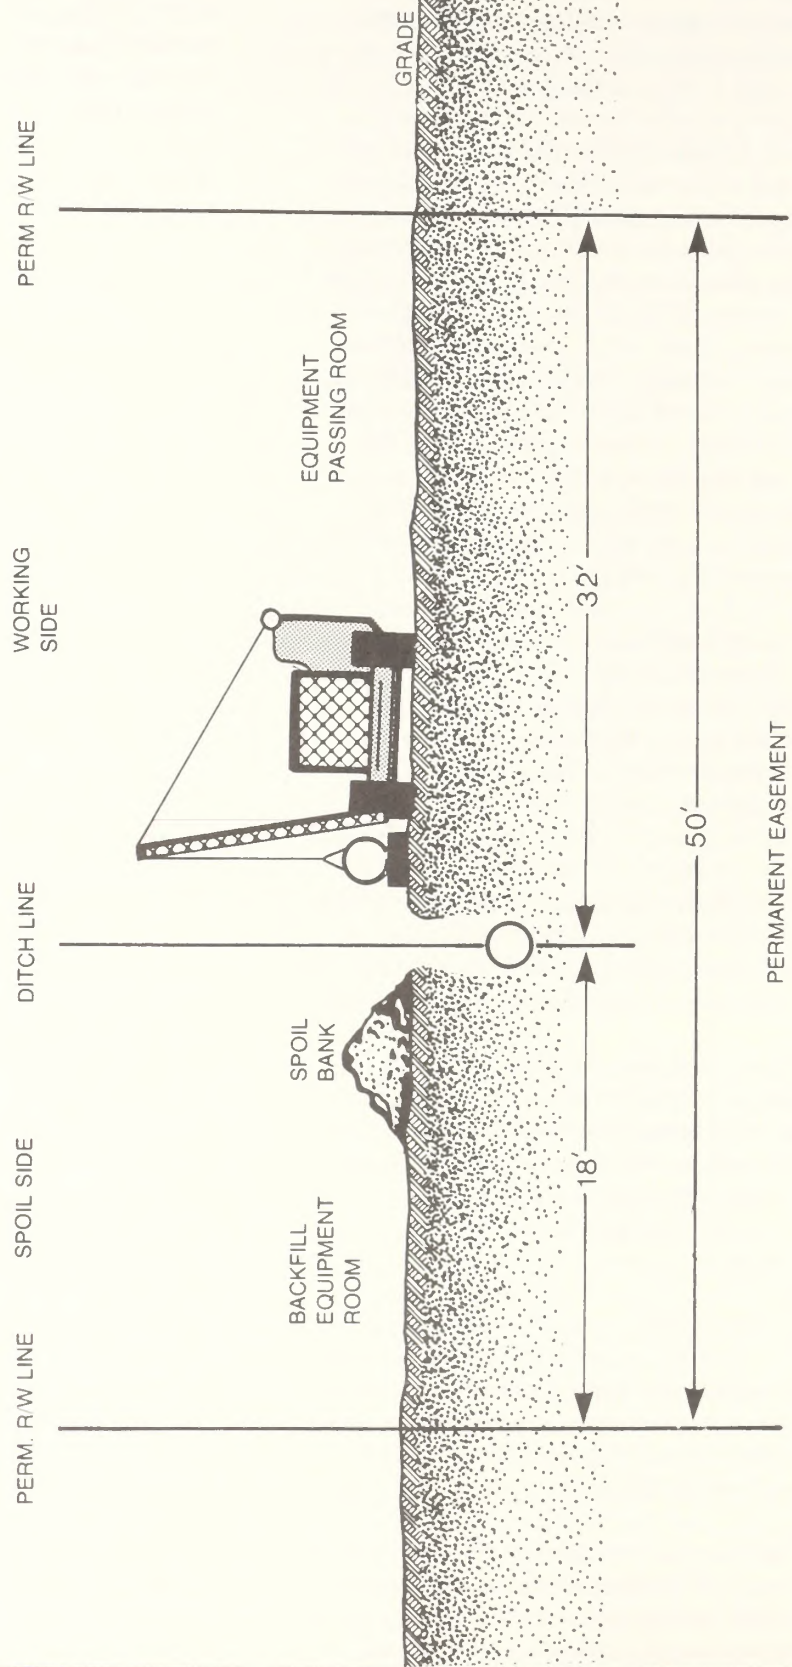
SINGLE PIPELINE RIGHT-OF-WAY CONFIGURATION
